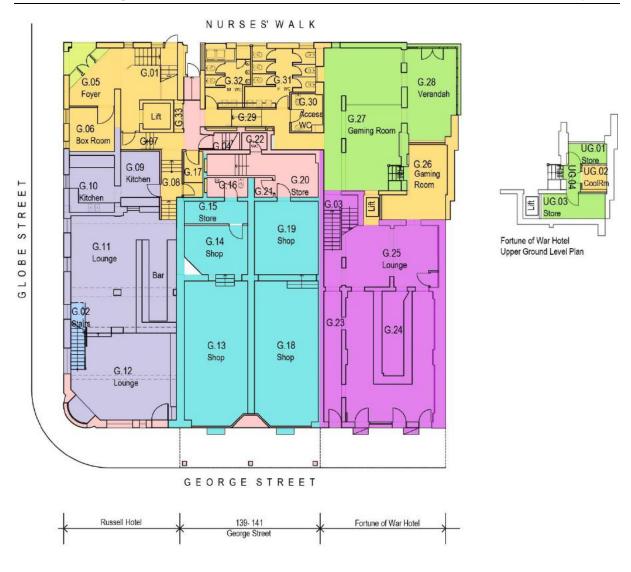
Phases of Development, Ground Floor Plan Level, TKD Architects (NTS)
